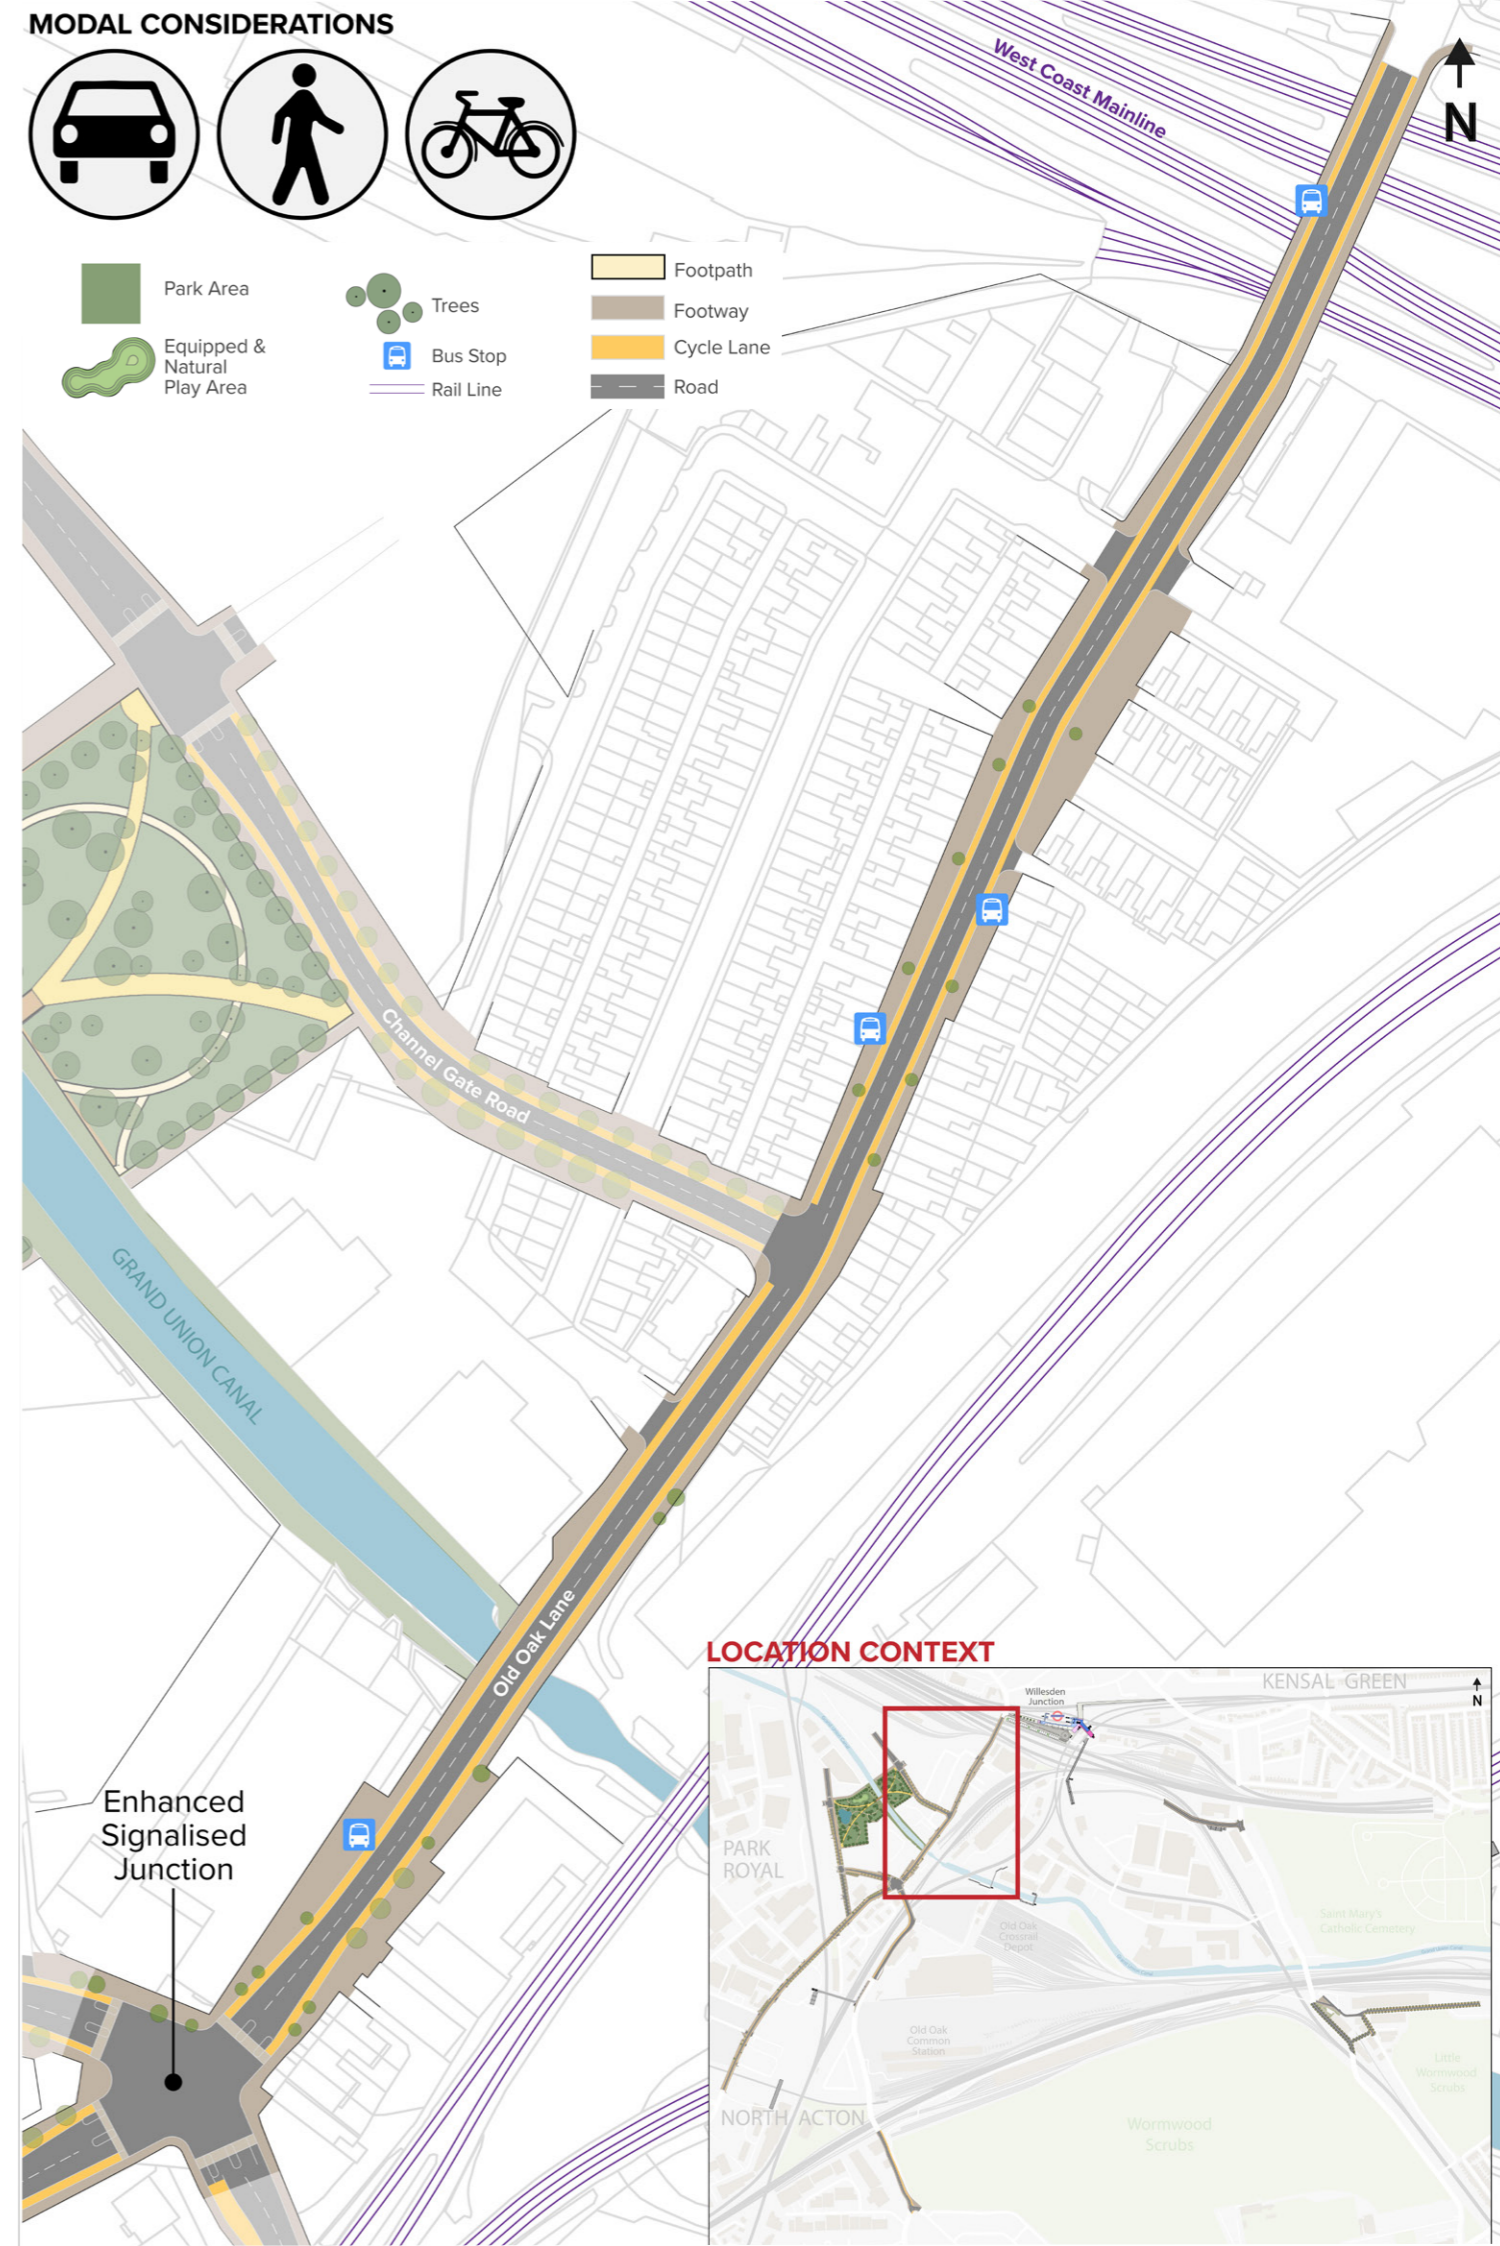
Intervention 4, proposed layout for Old Oak Lane
